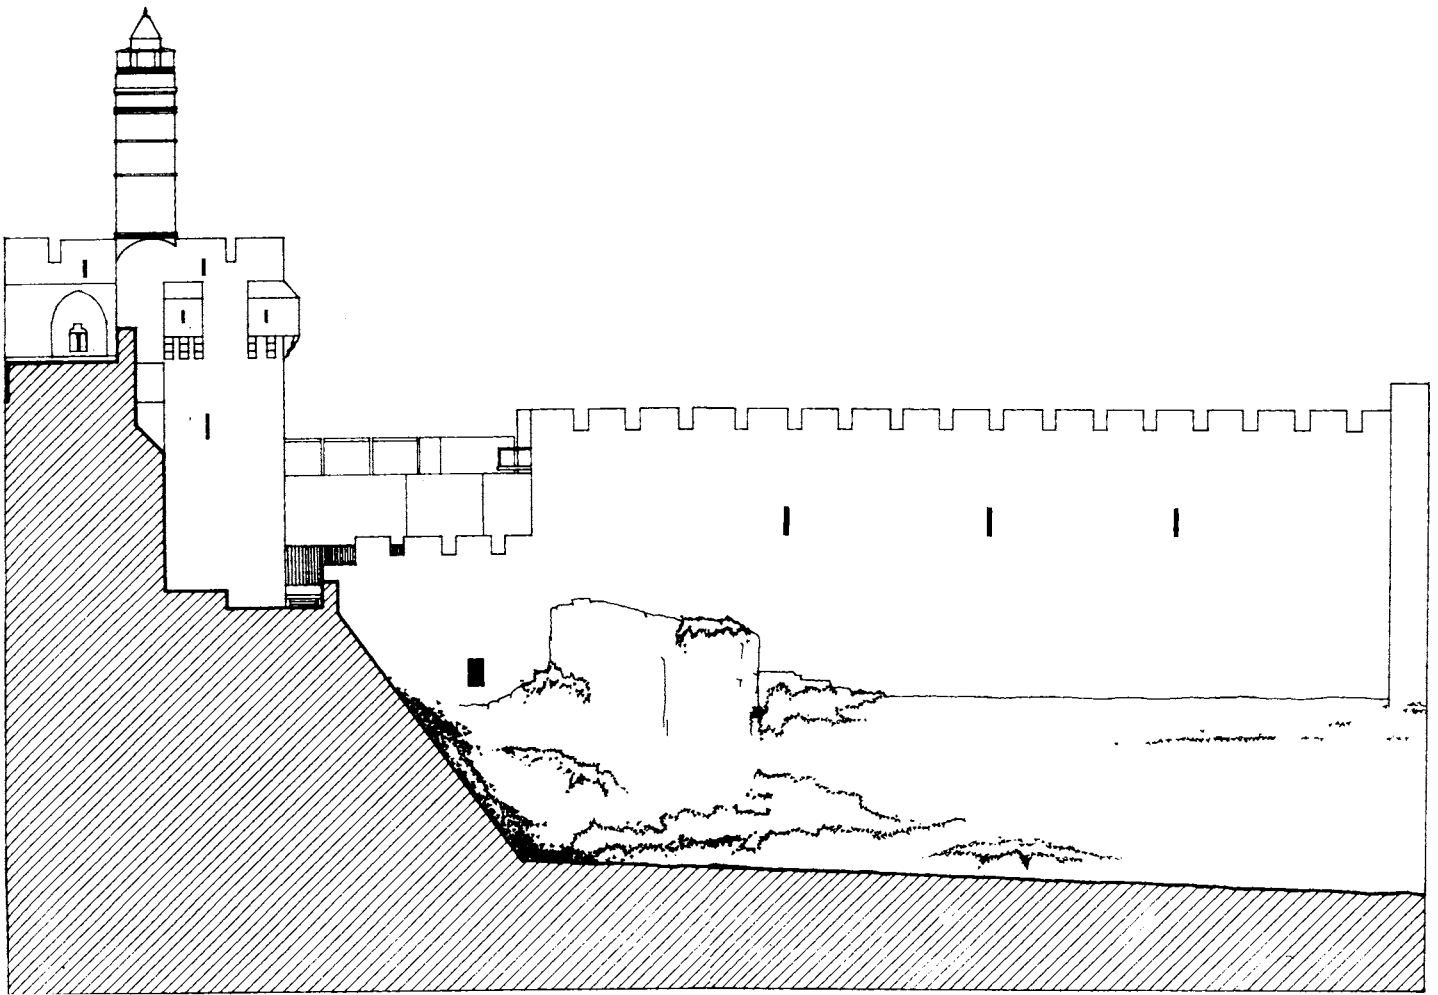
The Citadel of Jerusalem, South-West Tower: north-south section and elevation.
